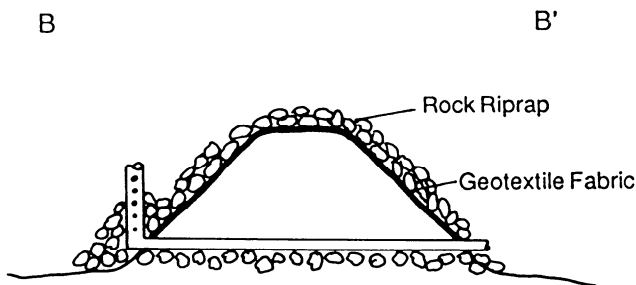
Cross section B-B¹ of dewatering type of internal check dam.
